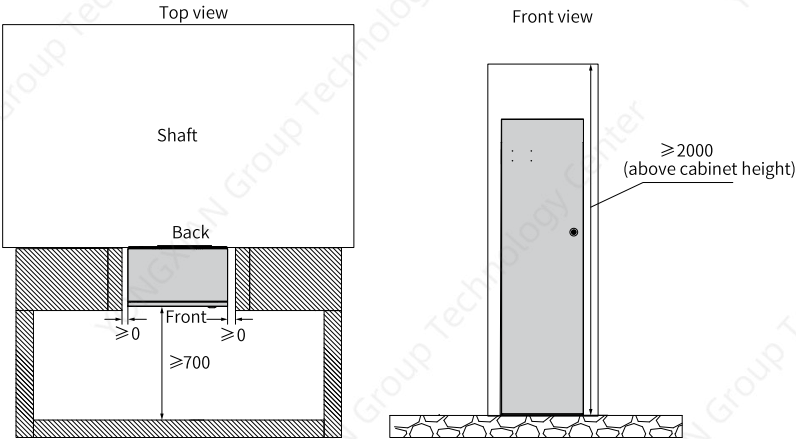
Mounting clearance requirements of the MRL control cabinet (Unit: mm)
